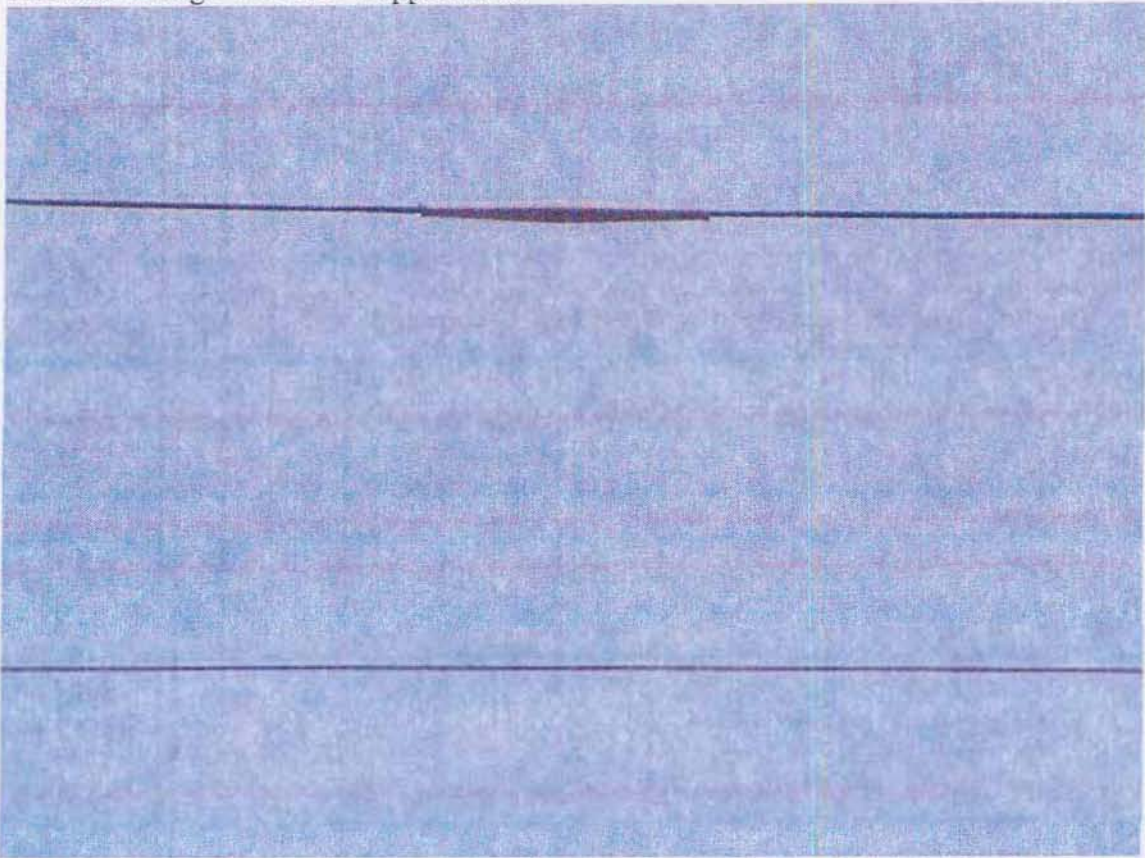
Next splice to the east at right in photo # 19 – Photo taken 7-24-2007
